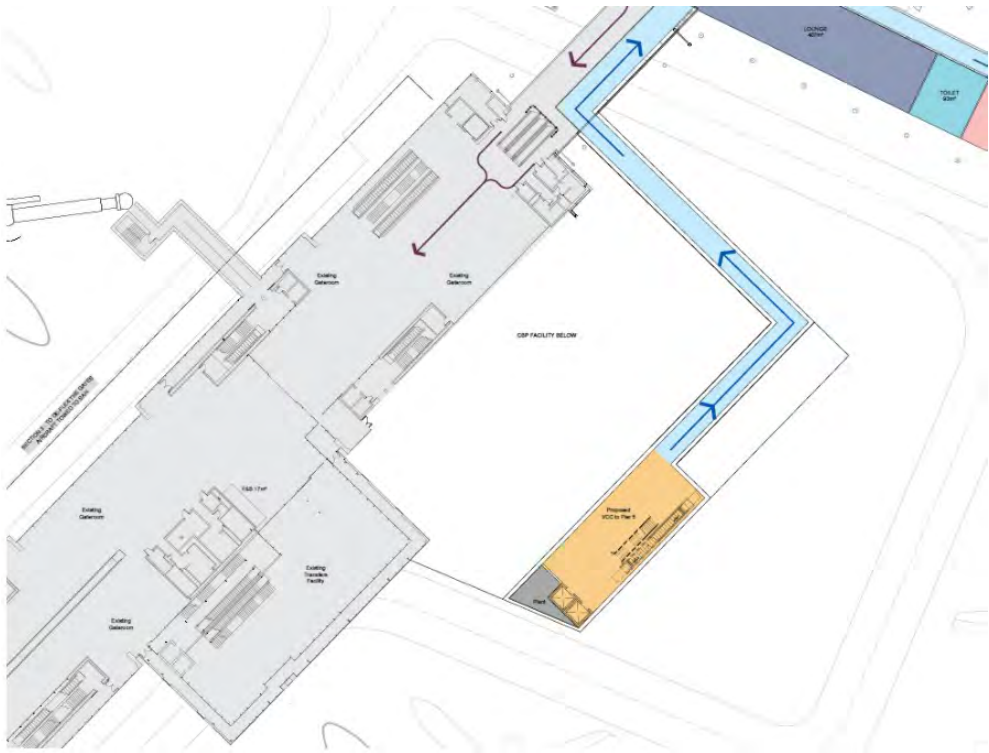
Pier 4 proposed enlarged CBP facility on the first floor
